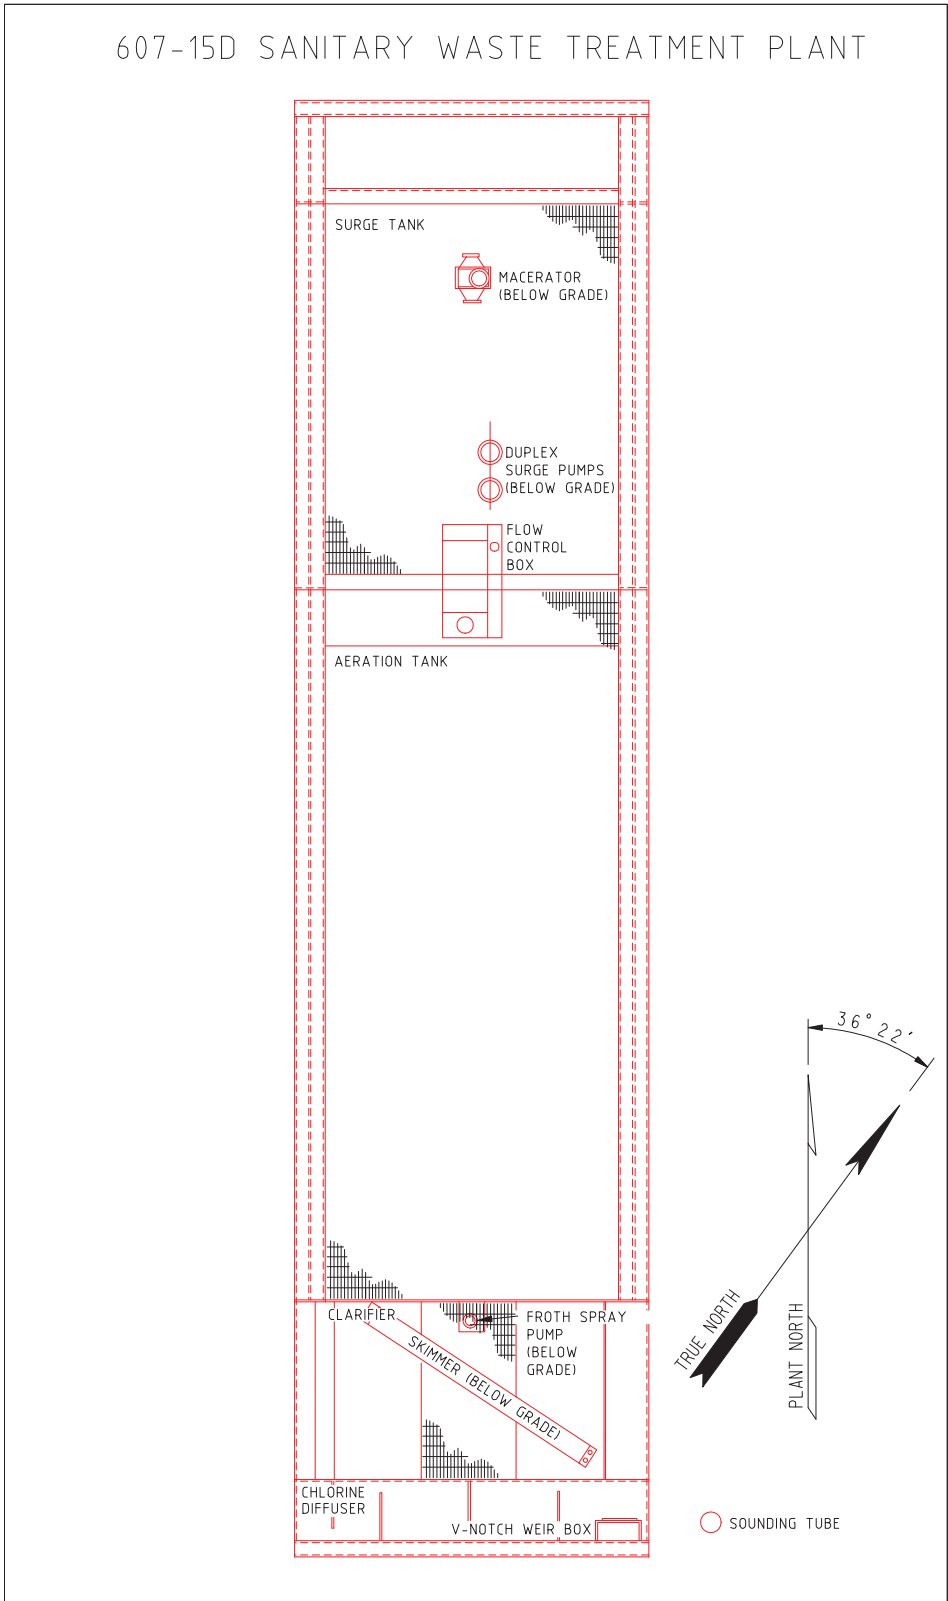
Building 607-15D, Sanitary Waste Treatment Plant
